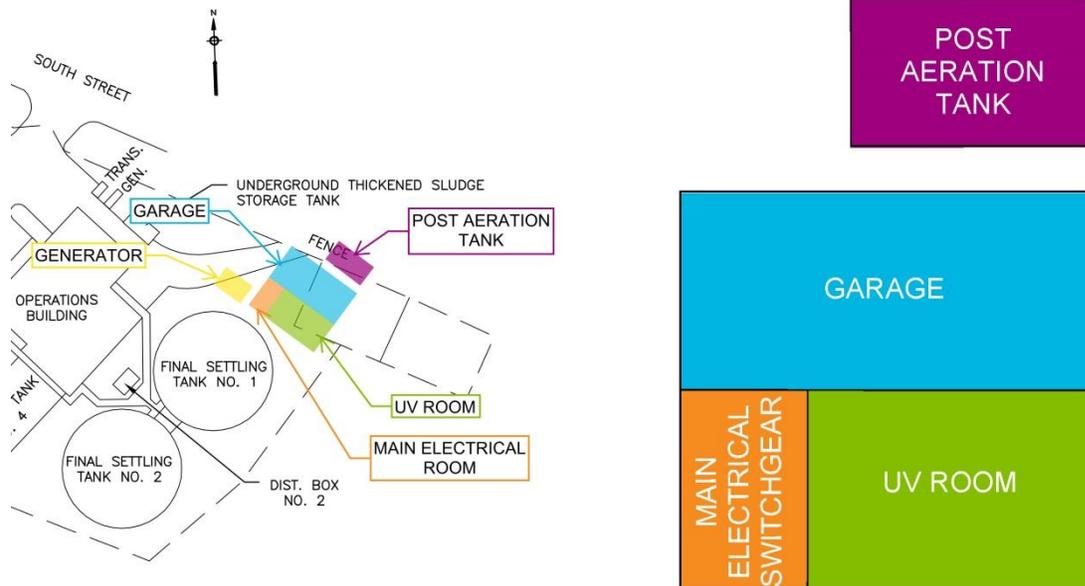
RECOMMENDED UV DISINFECTION, SWITCHGEAR AND GARAGE BUILDING AND POST AERATION TANK LAYOUT
